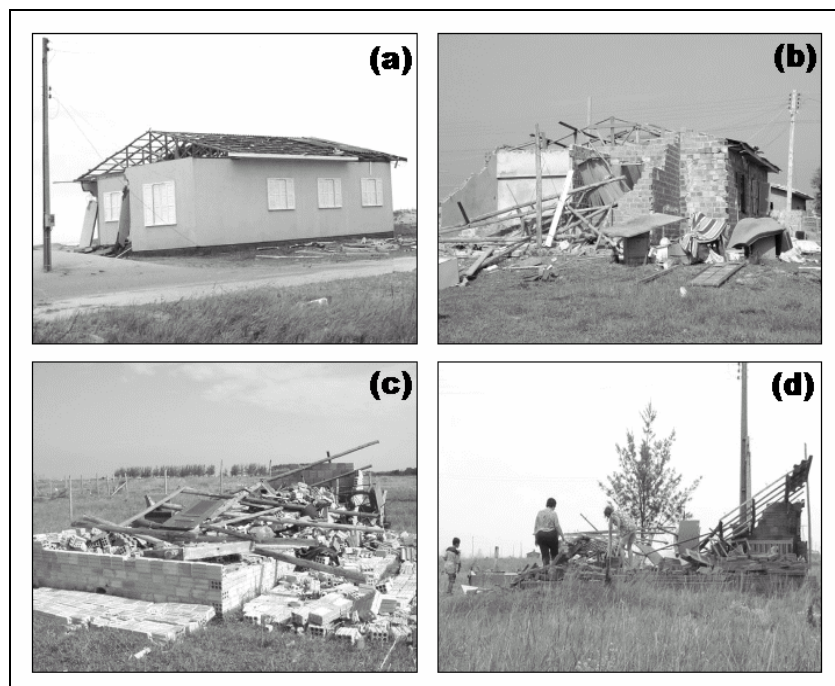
Type of damage caused by wind force at Balneário Arroio do Silva (SC): (a) roof failure; (b) partial collapse; and (c and d) total collapse of brick houses.
